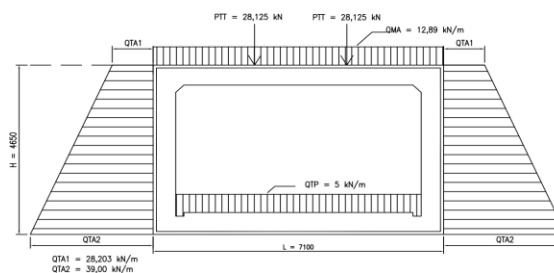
Sketch of External Forces Acting on the Box Culvert Segment
